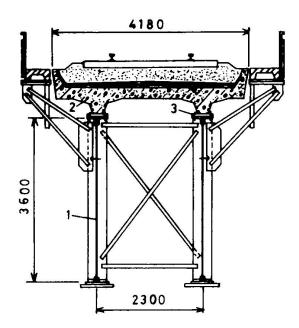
Typical superstructure cross section with ballasted deck. 1 - steel girder; 2 - reinforced concrete slab; 3 - embedded item.
